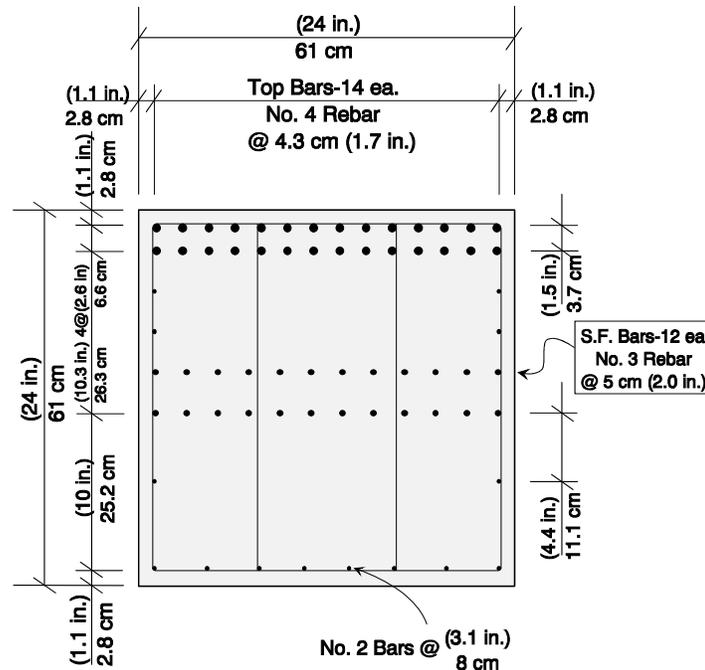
POJ-RC-100 overhang reinforcement cross-section details
